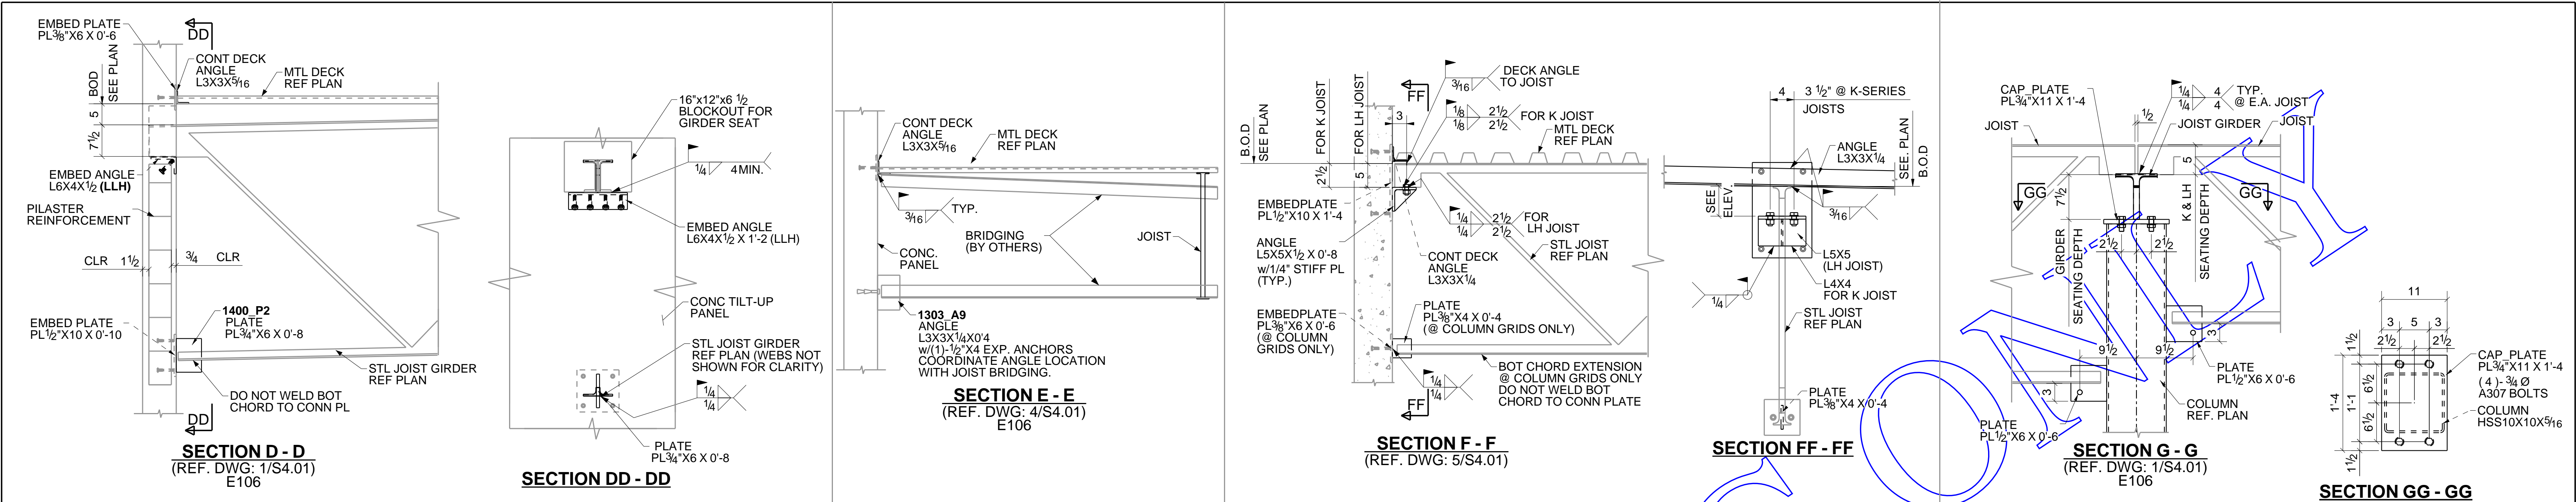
DETAILS OF : ELEVATIONS @ ROOF FRAMING REF. DWG. NO :
